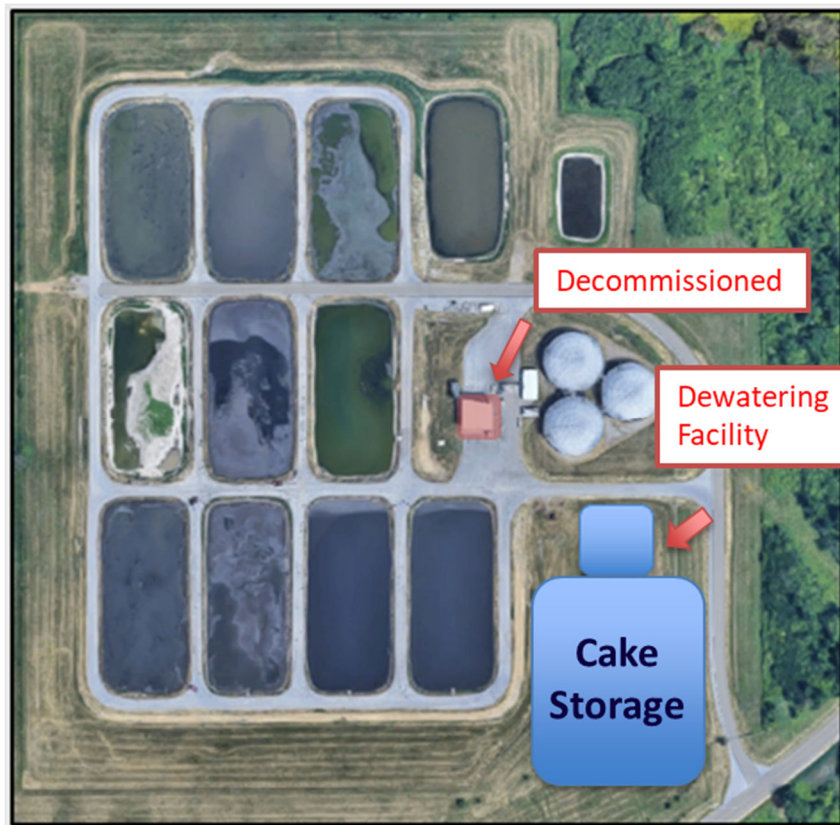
Strategy 2 – Garner Road Facility – Conceptual Site Plan
